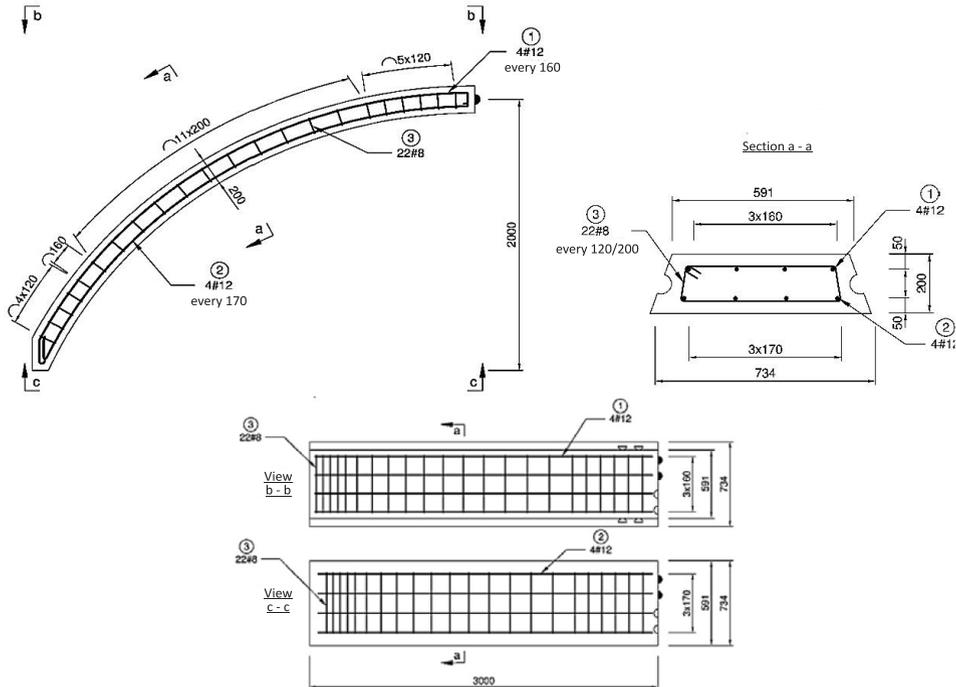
Form Type 1 module structural reinforcement [3]
